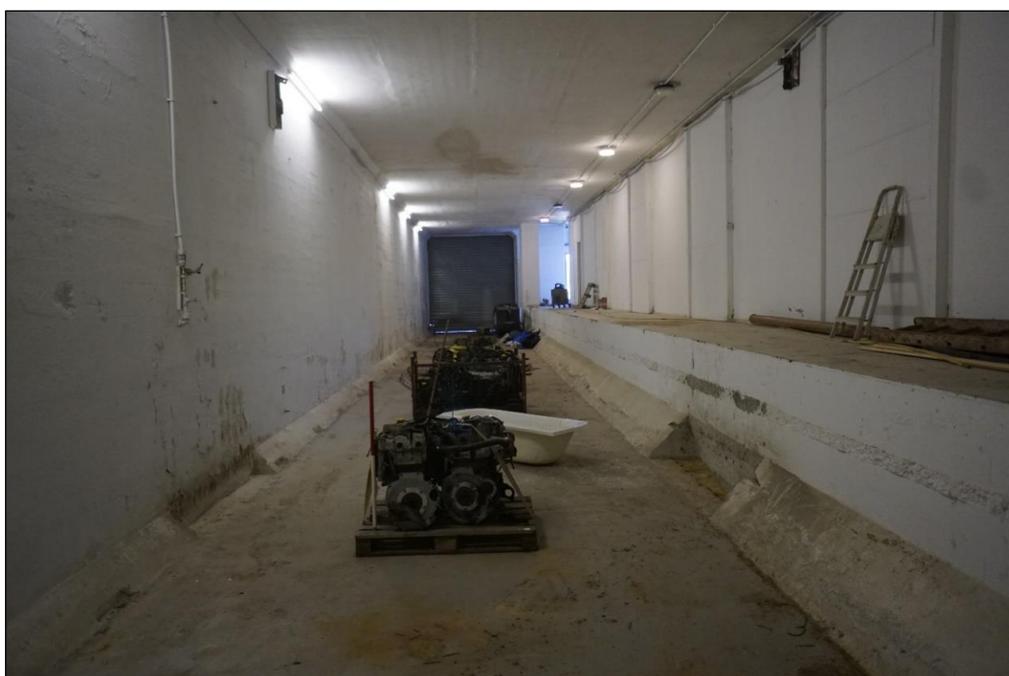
Loading bay facing north, showing the removal of the platform and blocked doorways on the cross-wall
